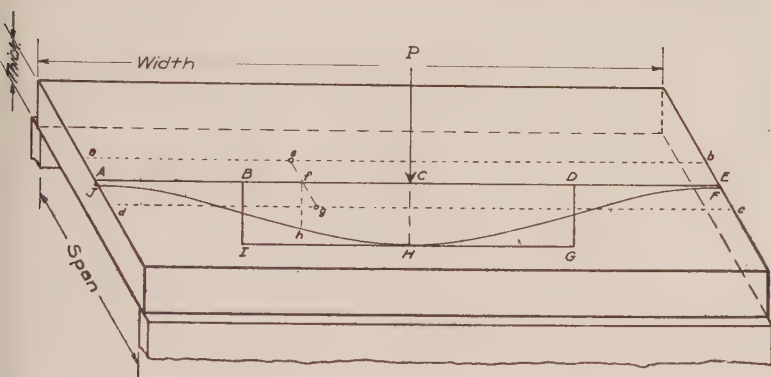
DIAGRAM SHOWING ASSUMED CONDITIONS IN SLAB UNDER LOAD.
